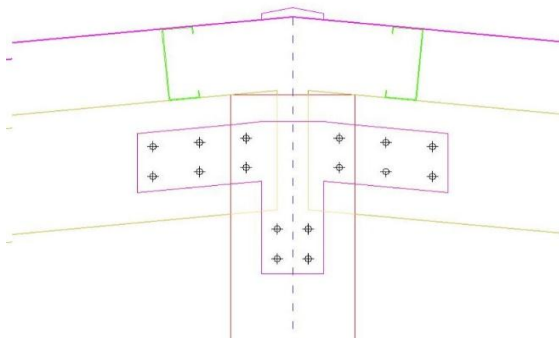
Bolted connection of Column and Rafter in CFS Structure
